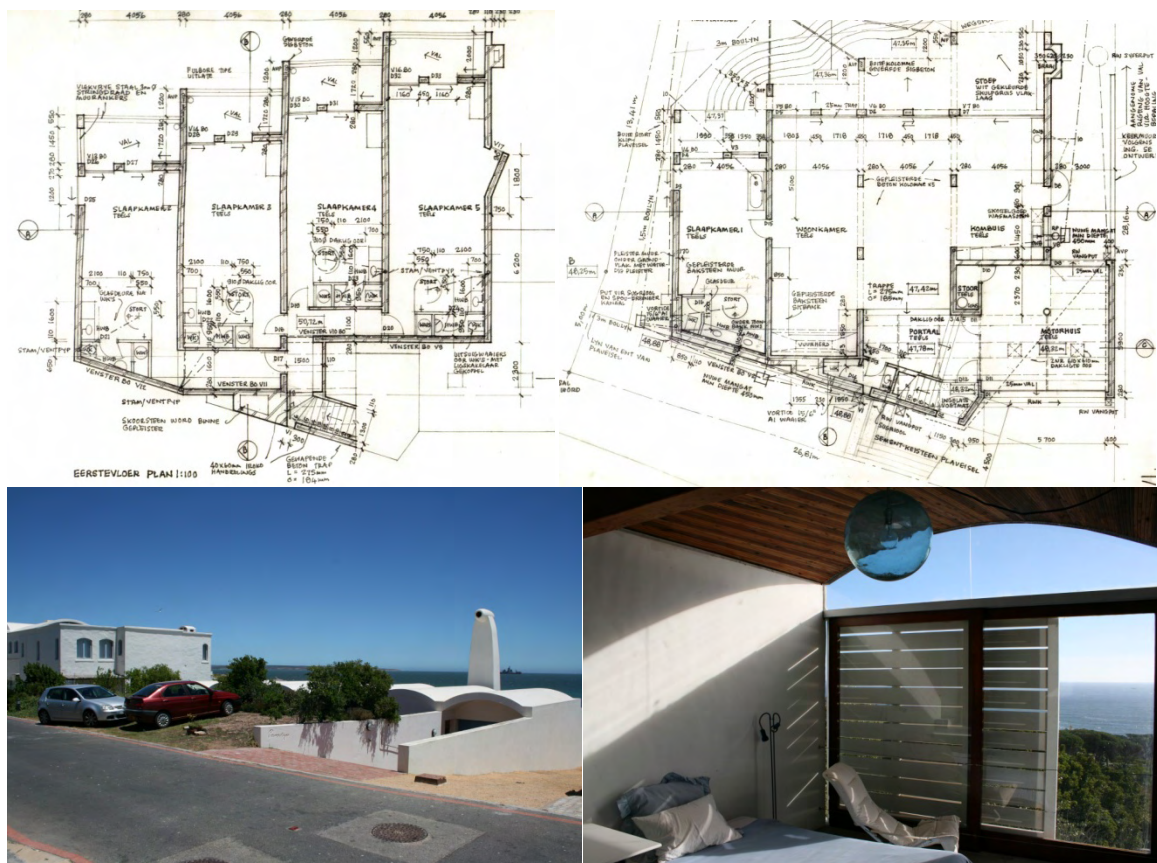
Top: First and ground floor plans of House Brink (2002) showing extent of accommodation (Fagan archive - Job No. 0206). Bottom left: House Paradys (2003) 'disappears' below the road (Author, 2009). Bottom right: Southern Bedroom at Die Es with its high level views to the sky and distant focus on the Atlantic sea (Author, 2008).
